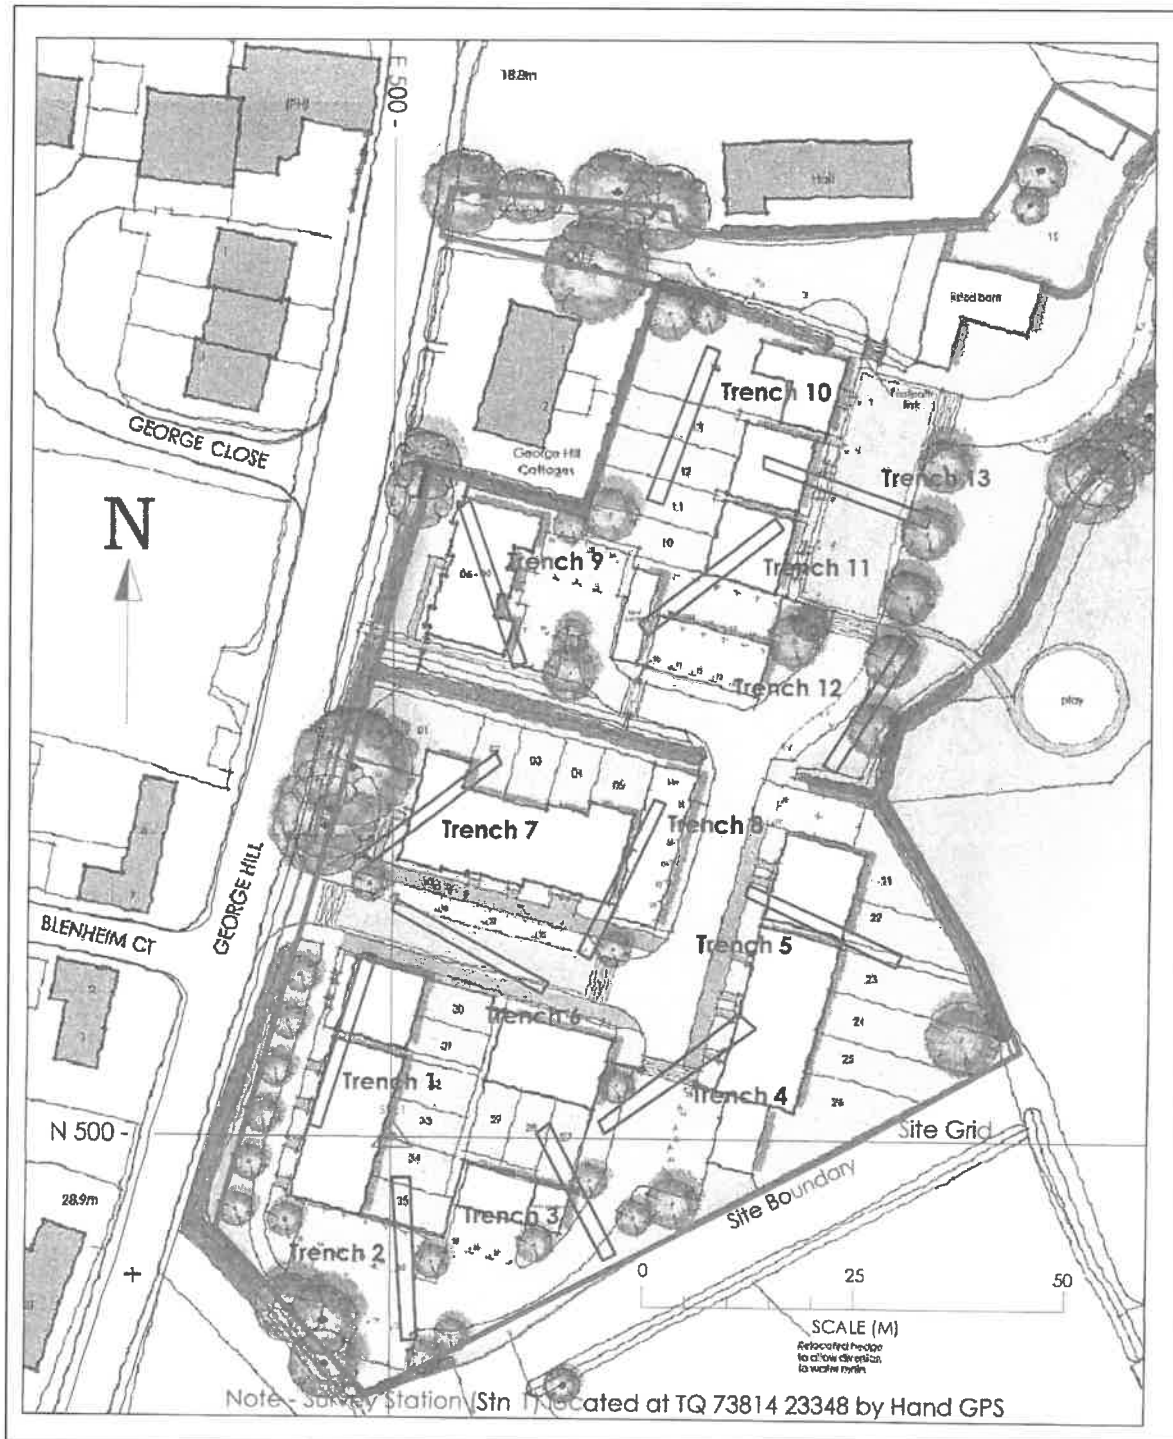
Grove Farm, Robertsbridge: Site Plan showing trenches superimposed over development plan
